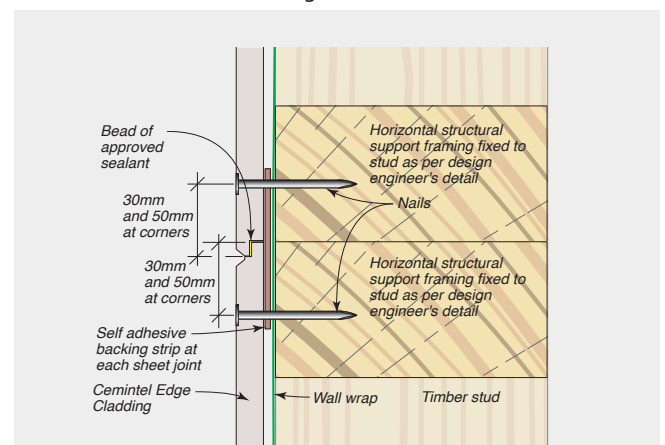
Typical Direct fix V Groove Cladding to Horizontal Structural Framing
